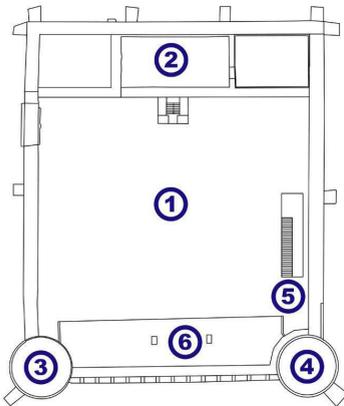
Plan of the castle in Ciechanów. Legend: 1. the courtyard, 2. the dwelling house, so called. “3. west (arsenal) tower, 4. eastern (prisoner) tower 5. Entry to sanitary supply 6. Small house (new volume), Source: K. Drobek
